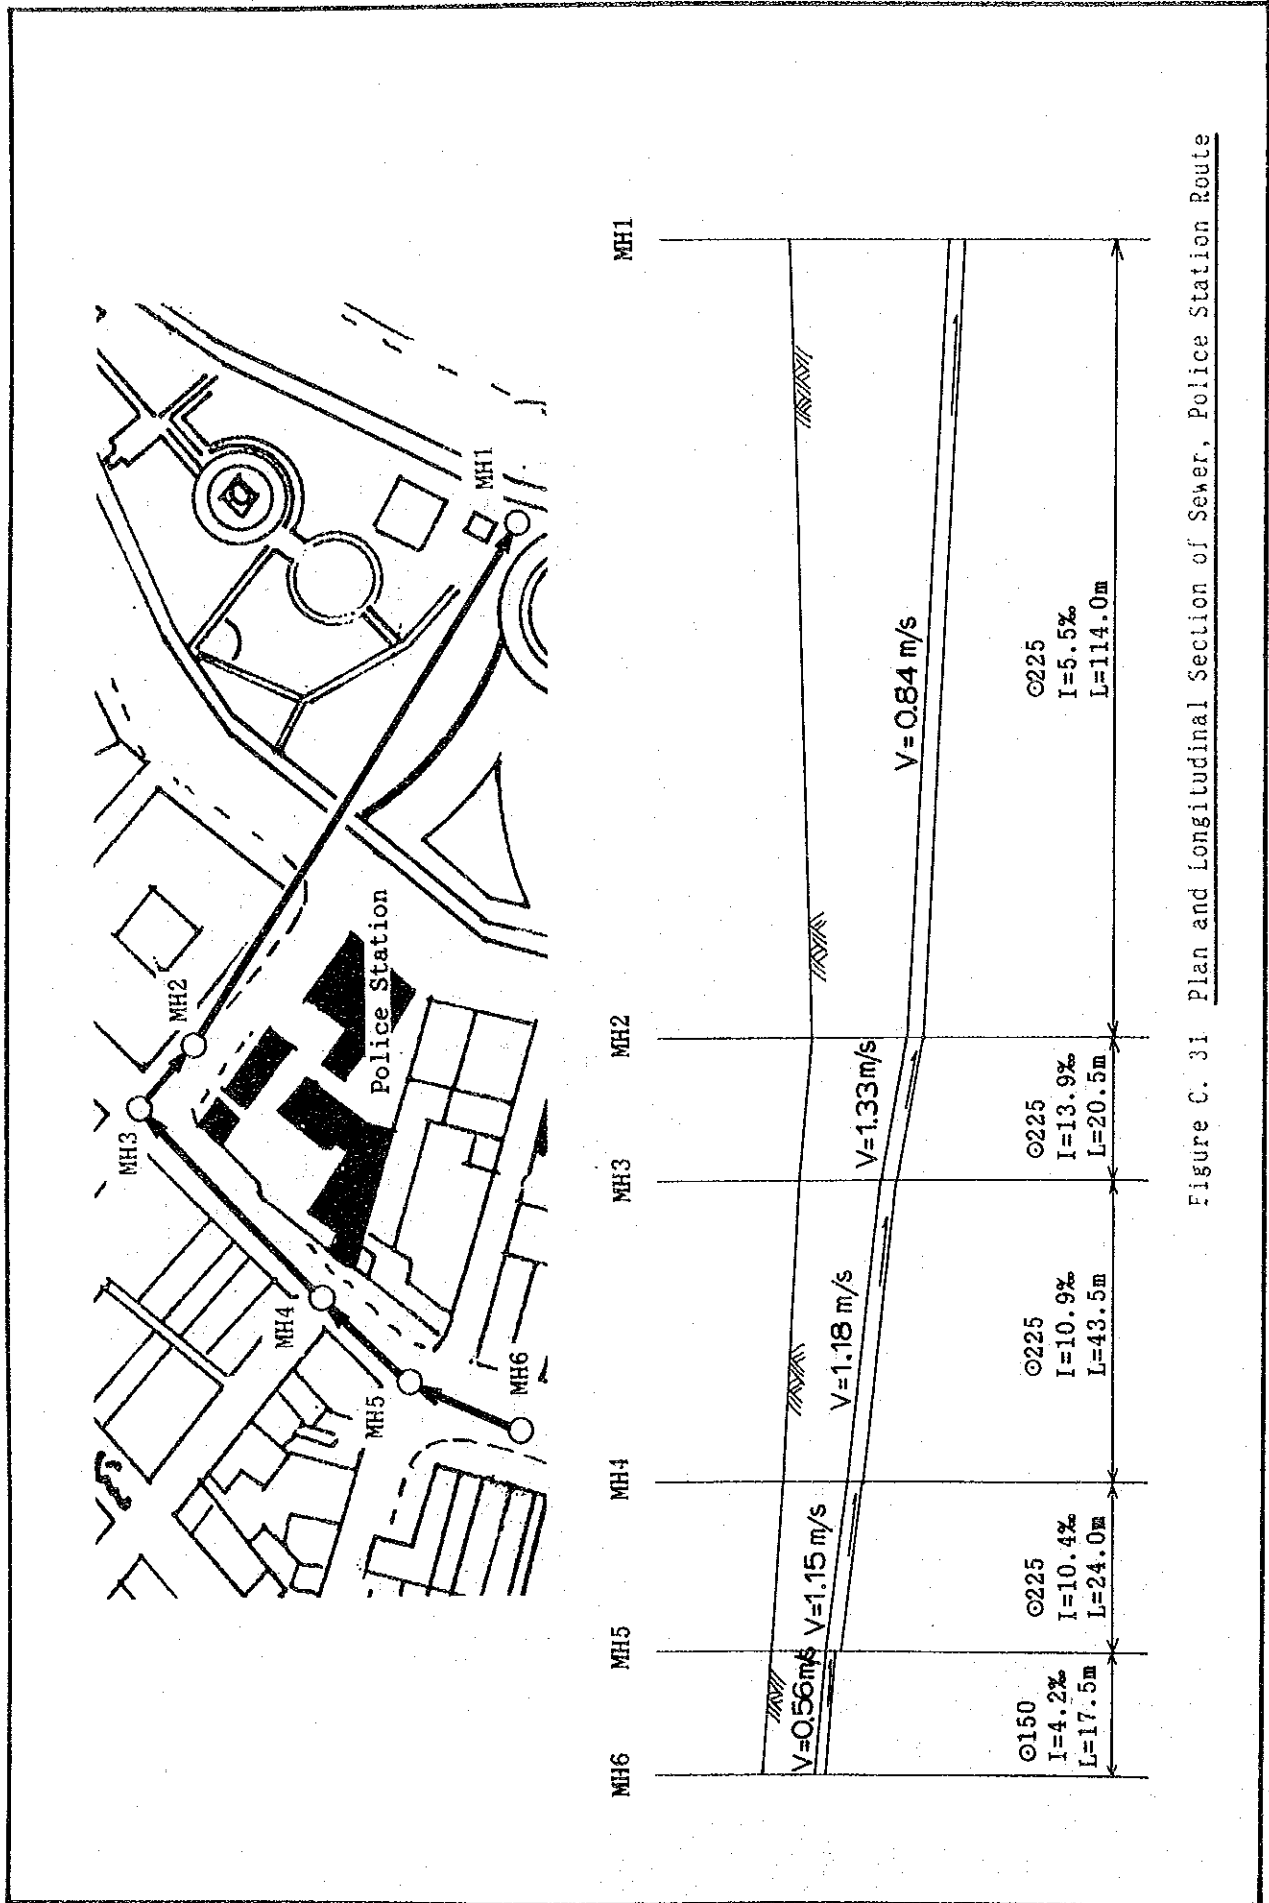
Plan and Longitudinal Section of Sewer, Police Station Route
